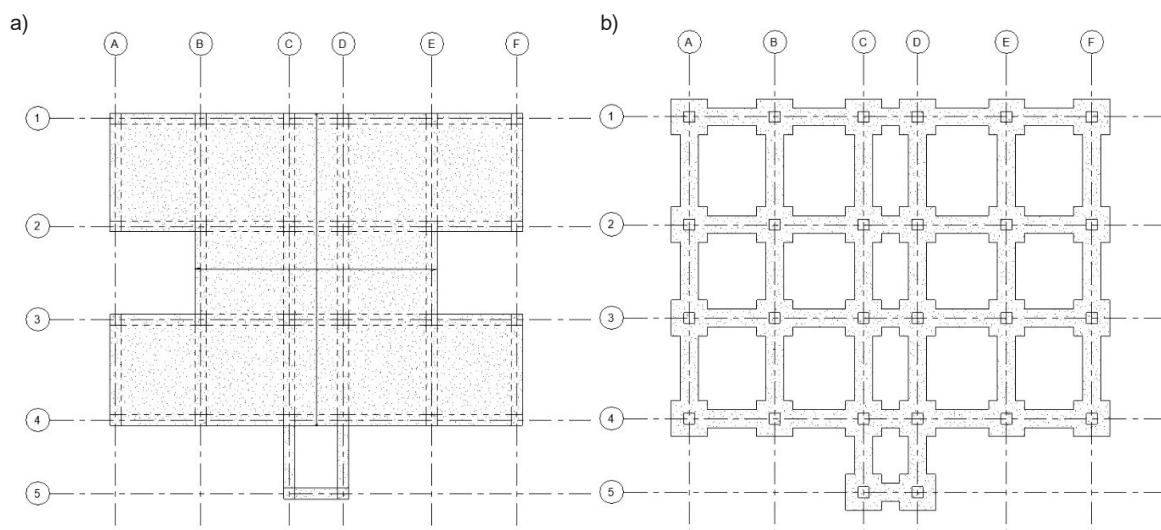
(a) Reinforced concrete slabs of the ceilings, (b) foundation of the three models in Revit Structure software
